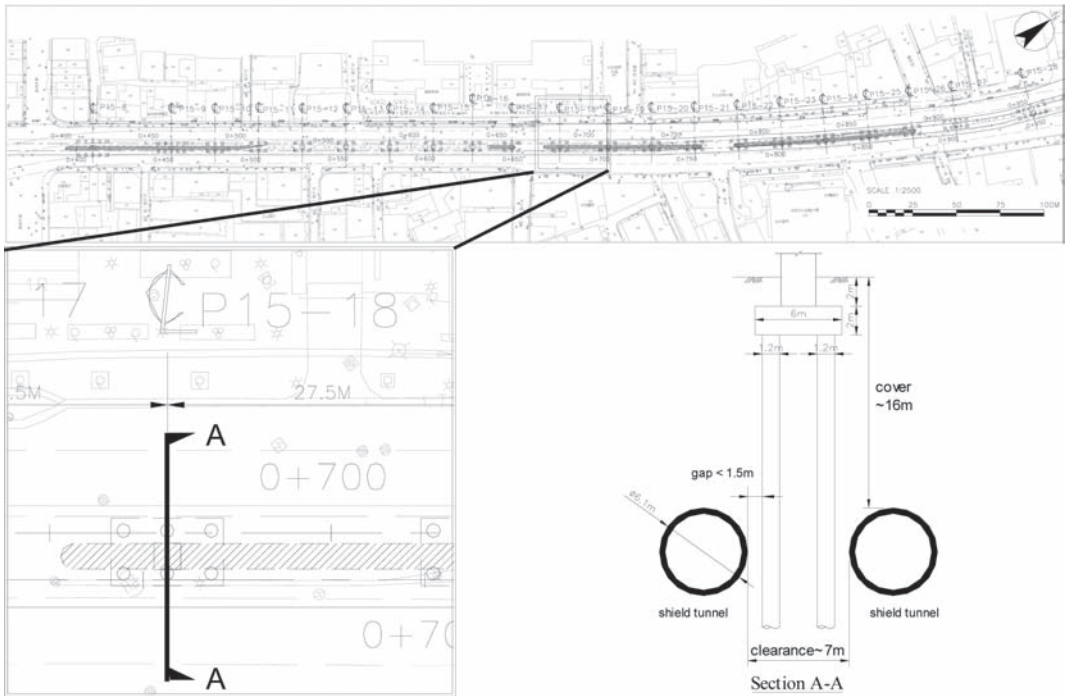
Schematic of plan view and typical cross-section of case study (Chang *et al.* 2010).
